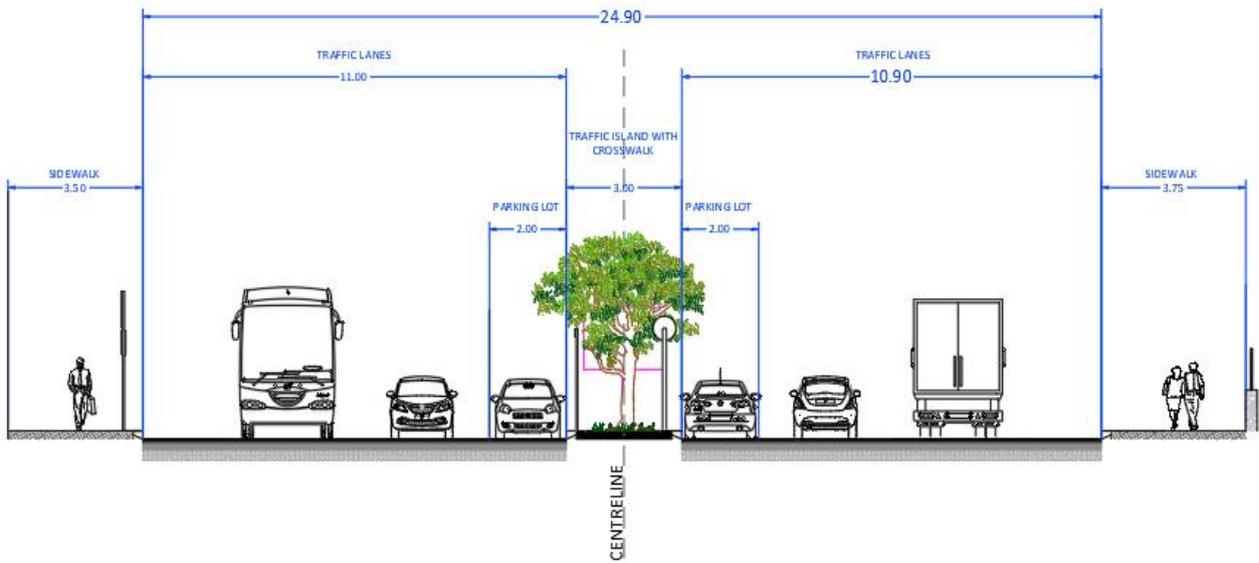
Cross section, section G-G', intersection II and III - Viale Papa Giovanni XXIII.
